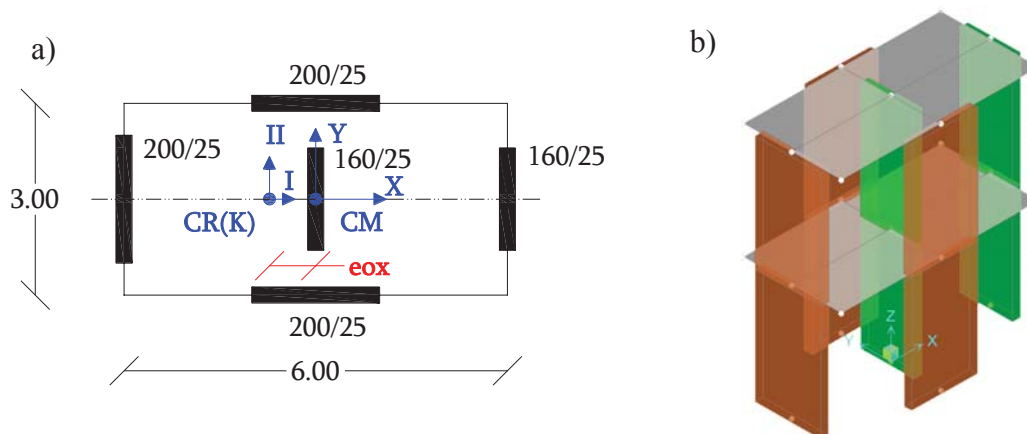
Two-story isotropic building: a) plan view; b) finite element model.
